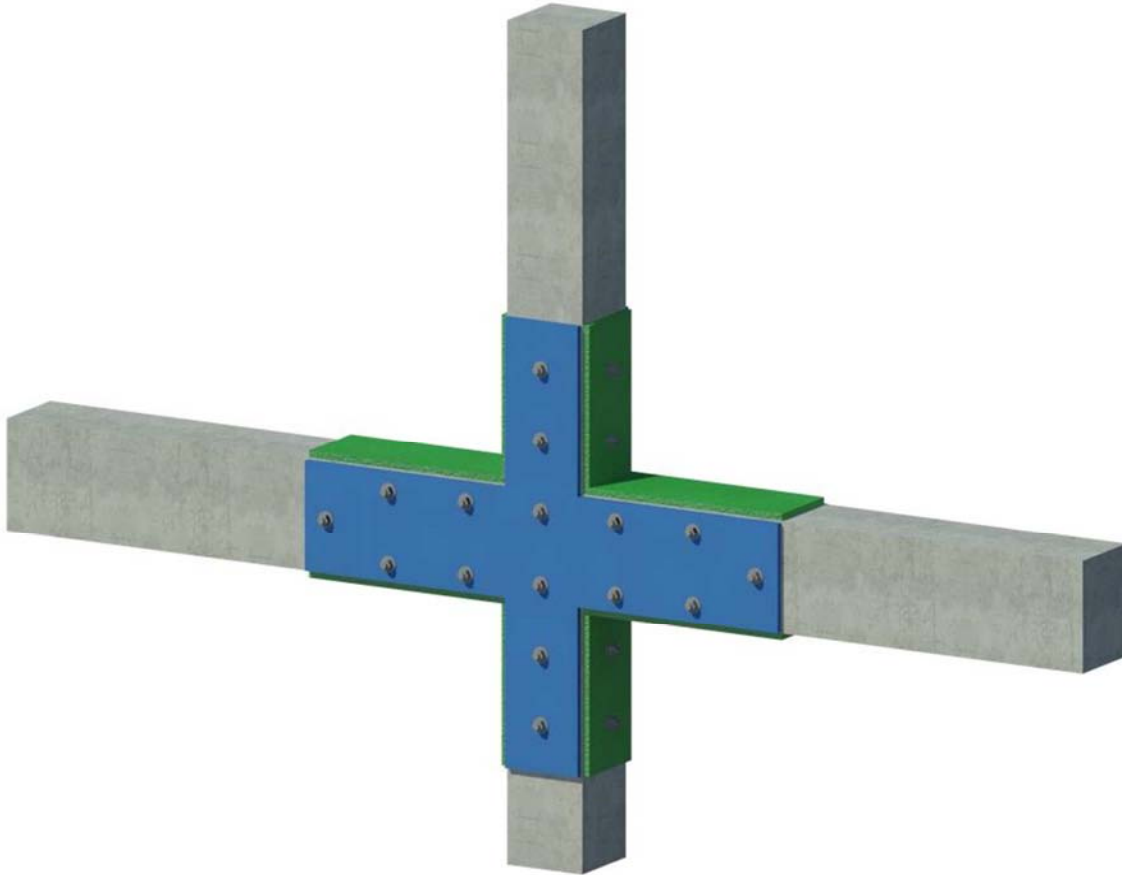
3D view of JPC joint after the precast retrofitting
